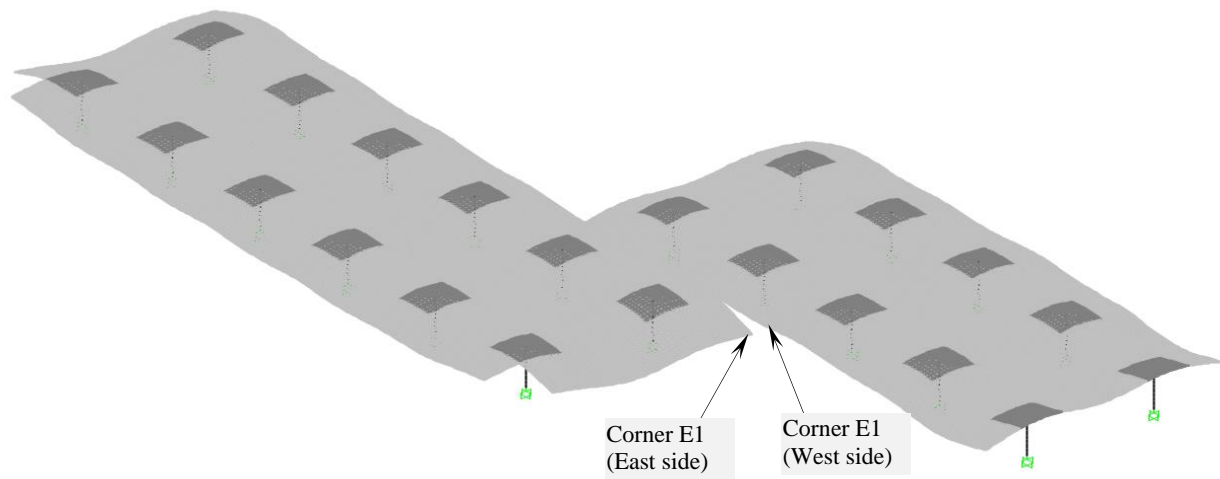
Deformed shape of portions of the east and west floors due to dead load
